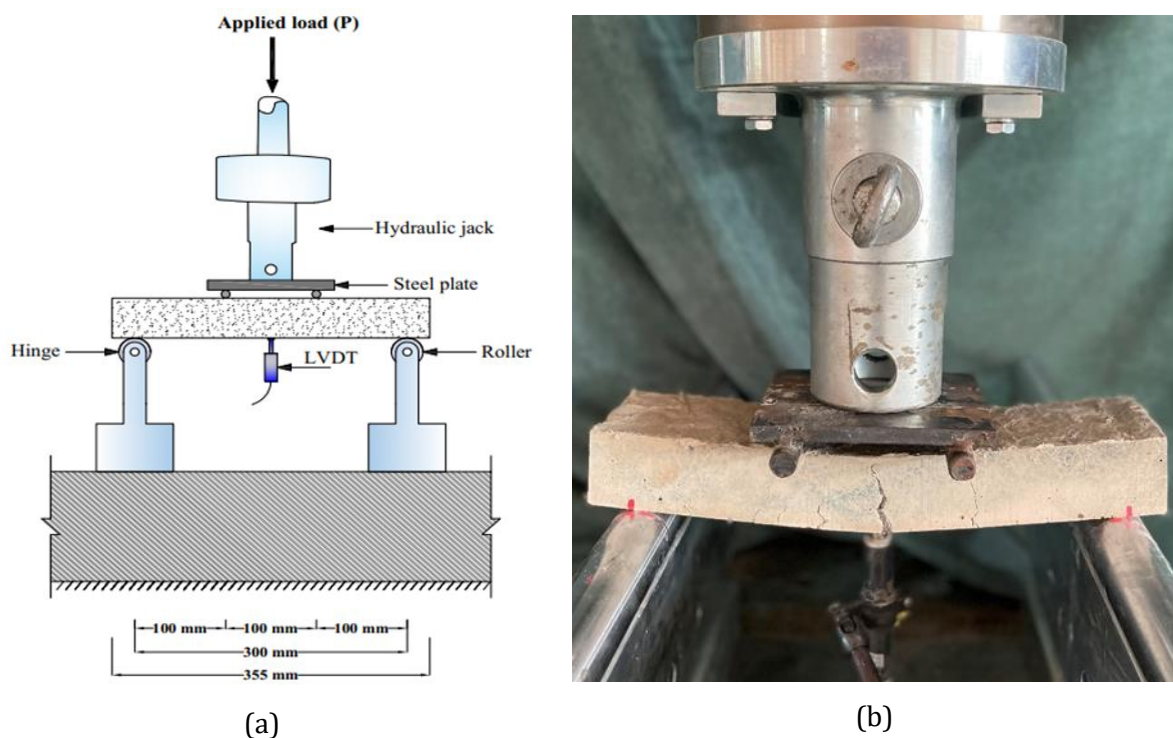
Test set of four-point flexural test (a) Test set up and (b) SEGC specimen
